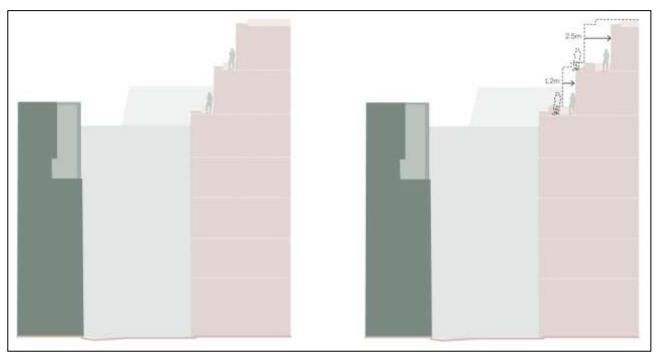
Section showing the northern elevation of the previously proposed building (to the left) and the revised proposed building to the right
